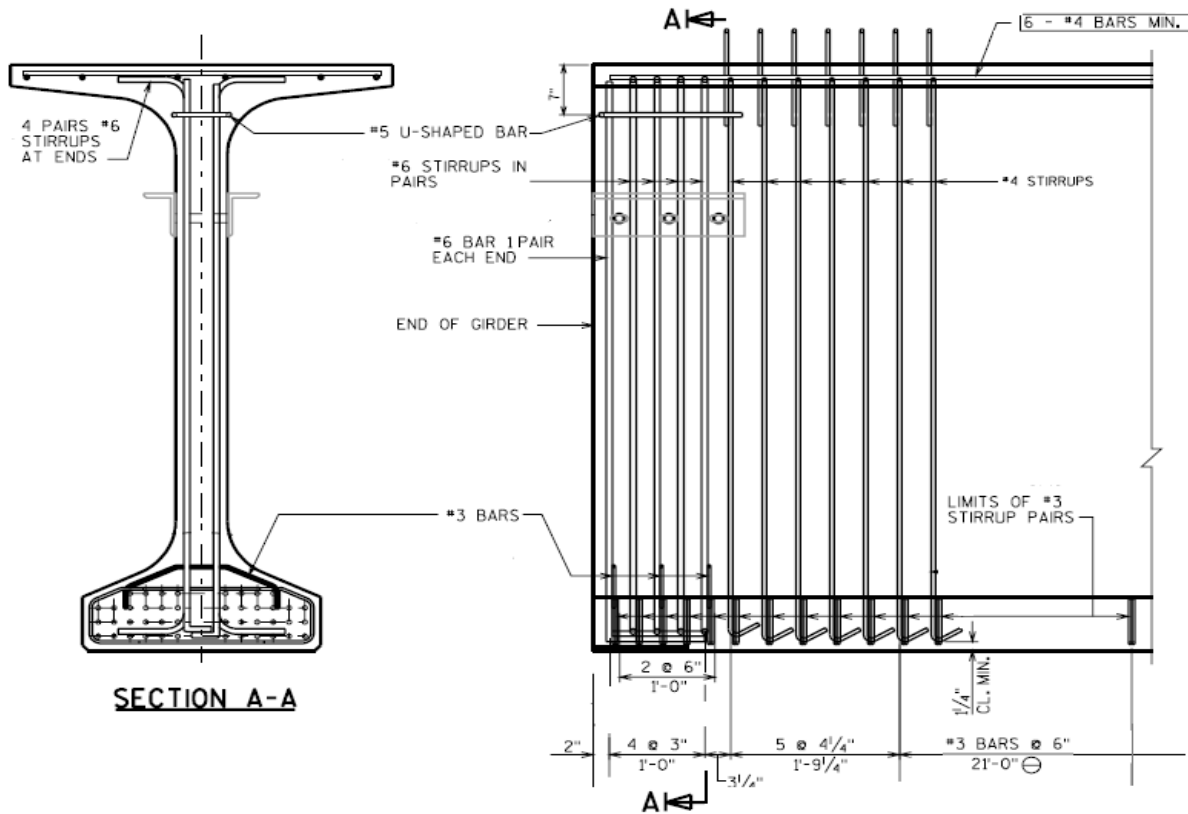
Standard end zone details of 54W, 72W and 82W girders.
